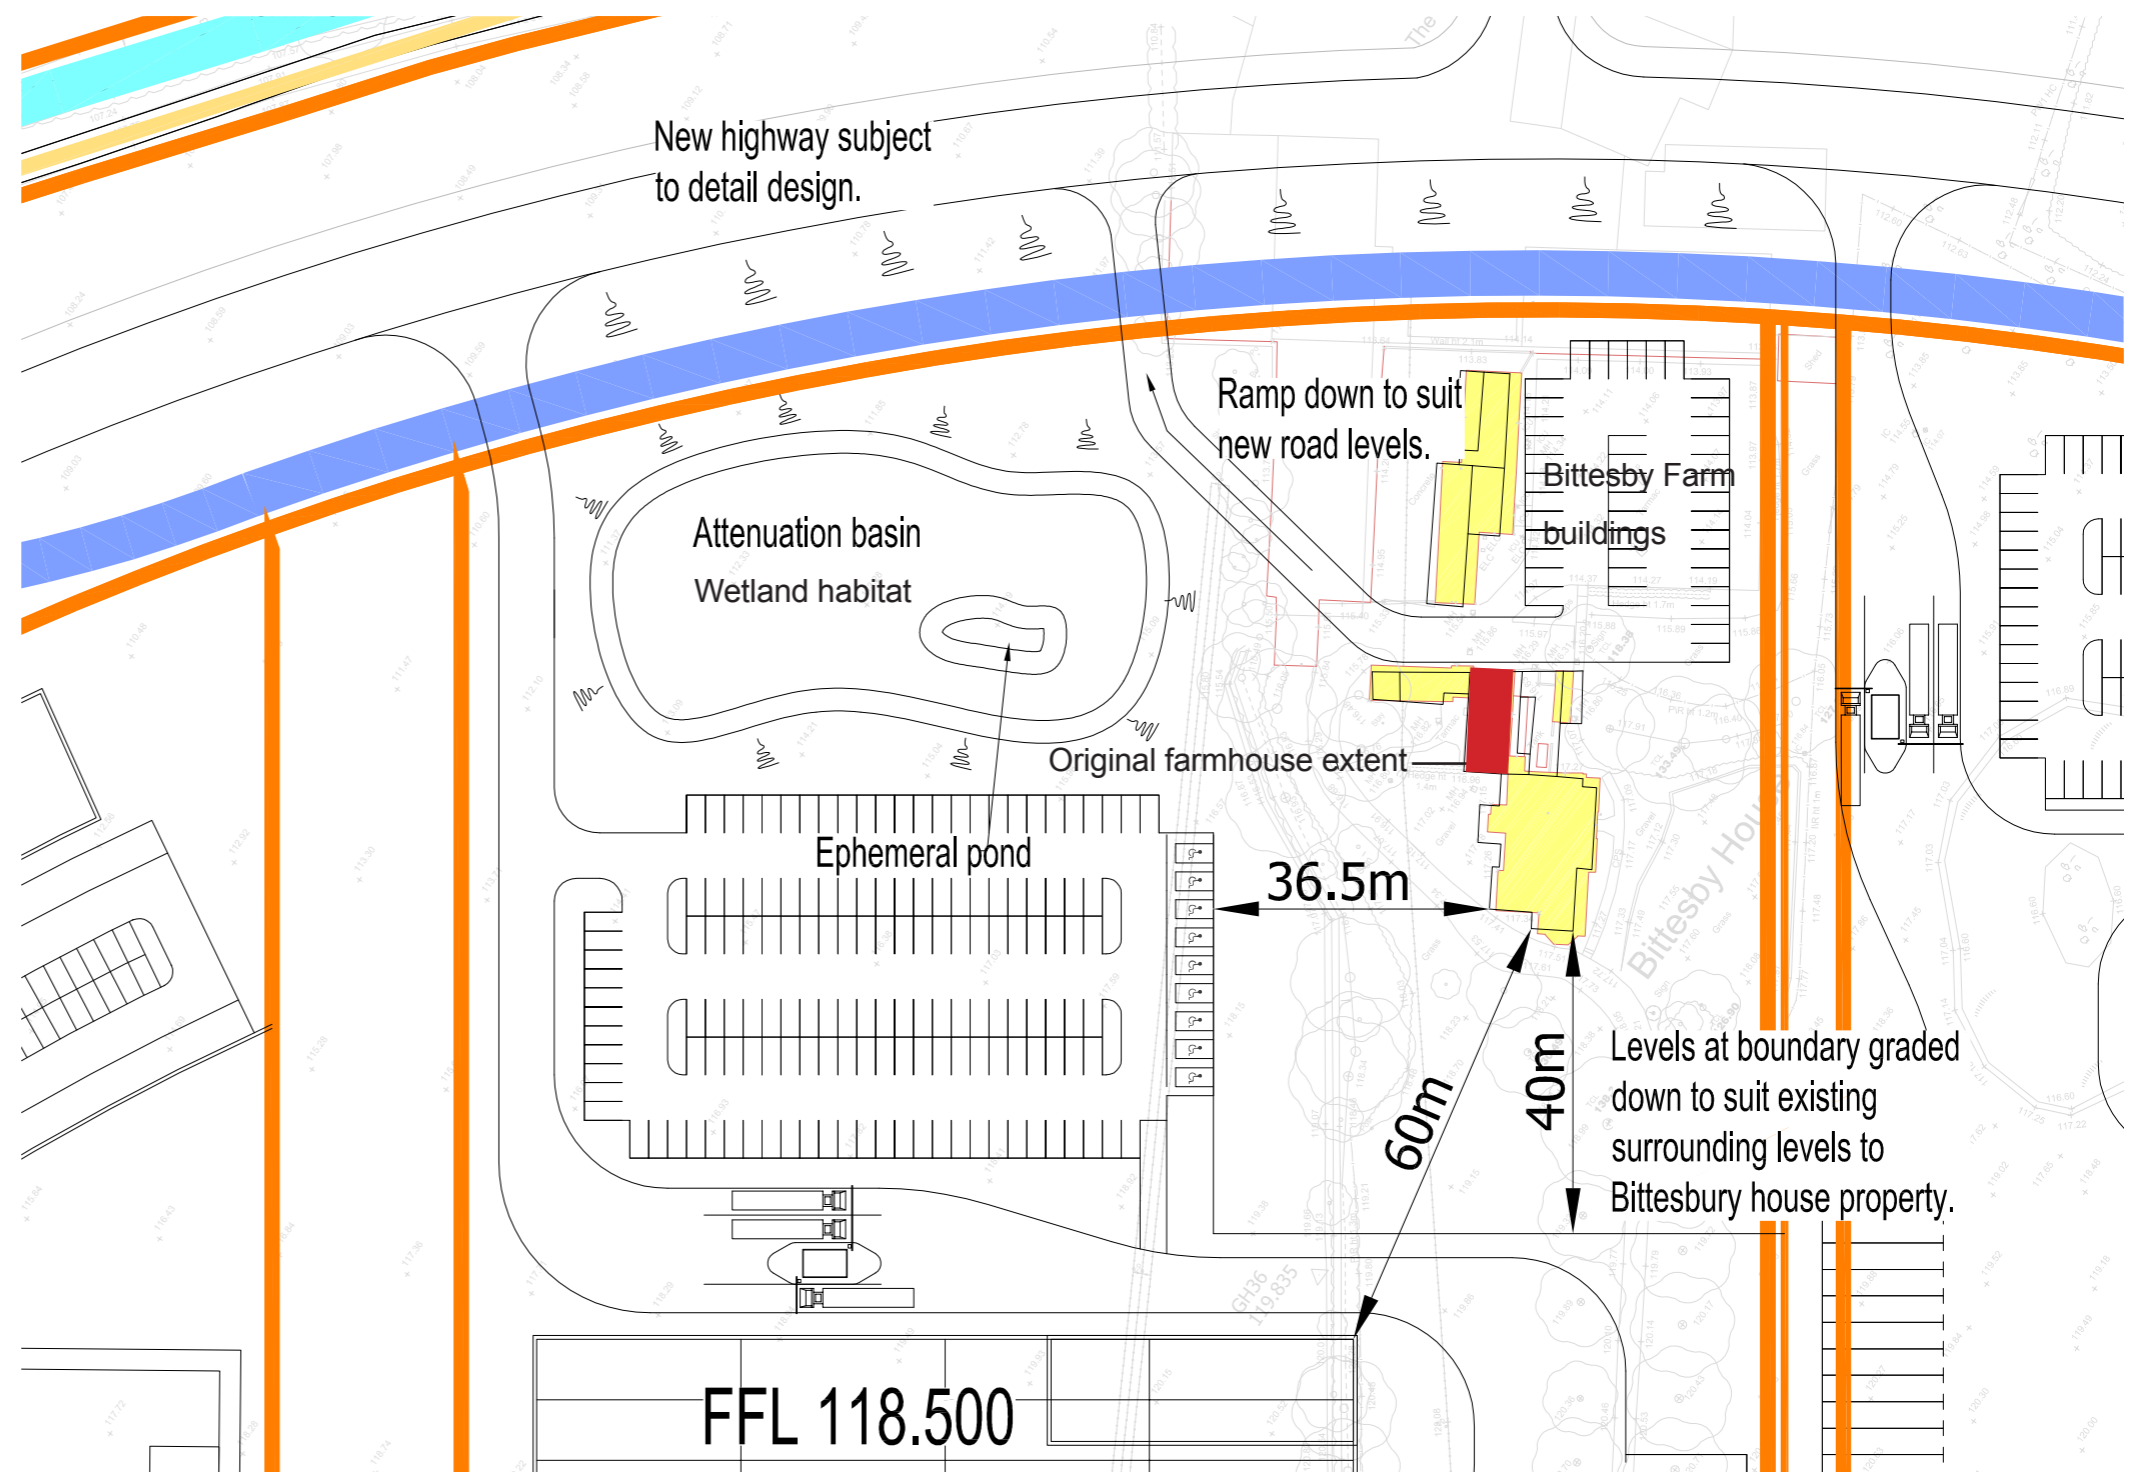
Proposal for the retention of Bittesby House, Farmyard outbuildings and immediate grounds
